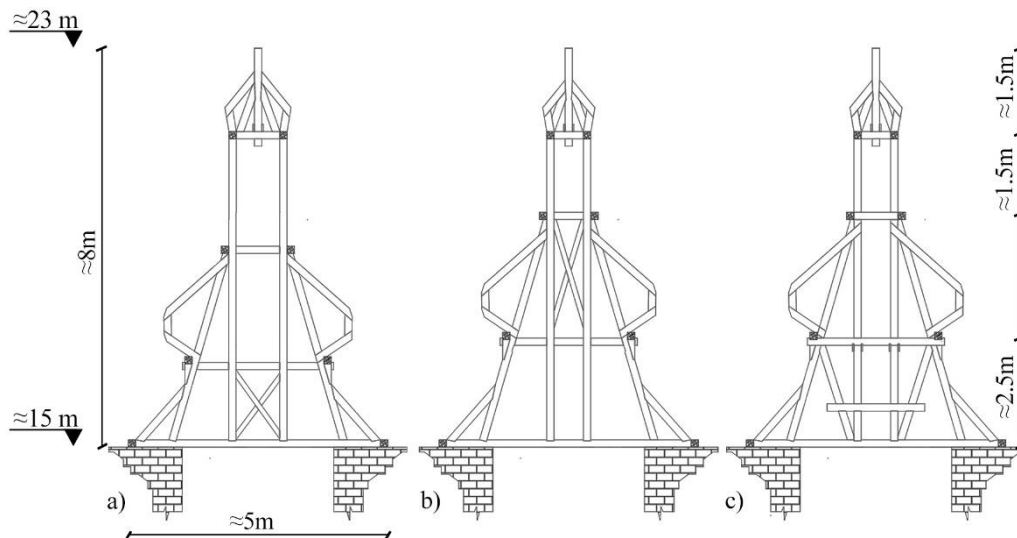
Bell tower roof structure types and characteristic dimensions
